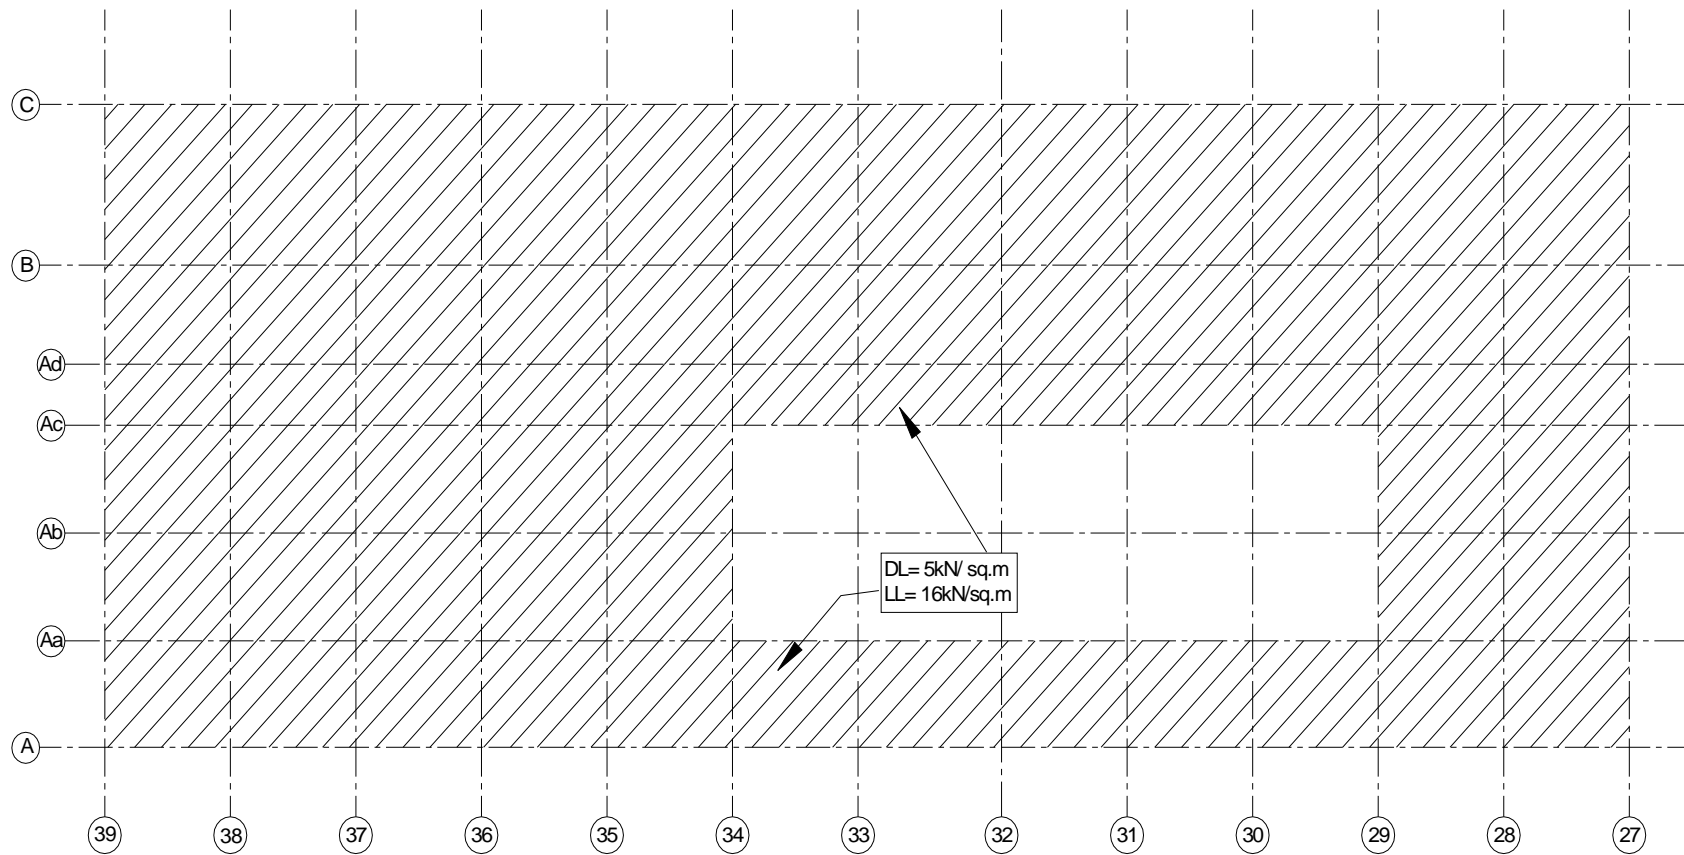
Load at Mezzanine Floor (8.5m level)
